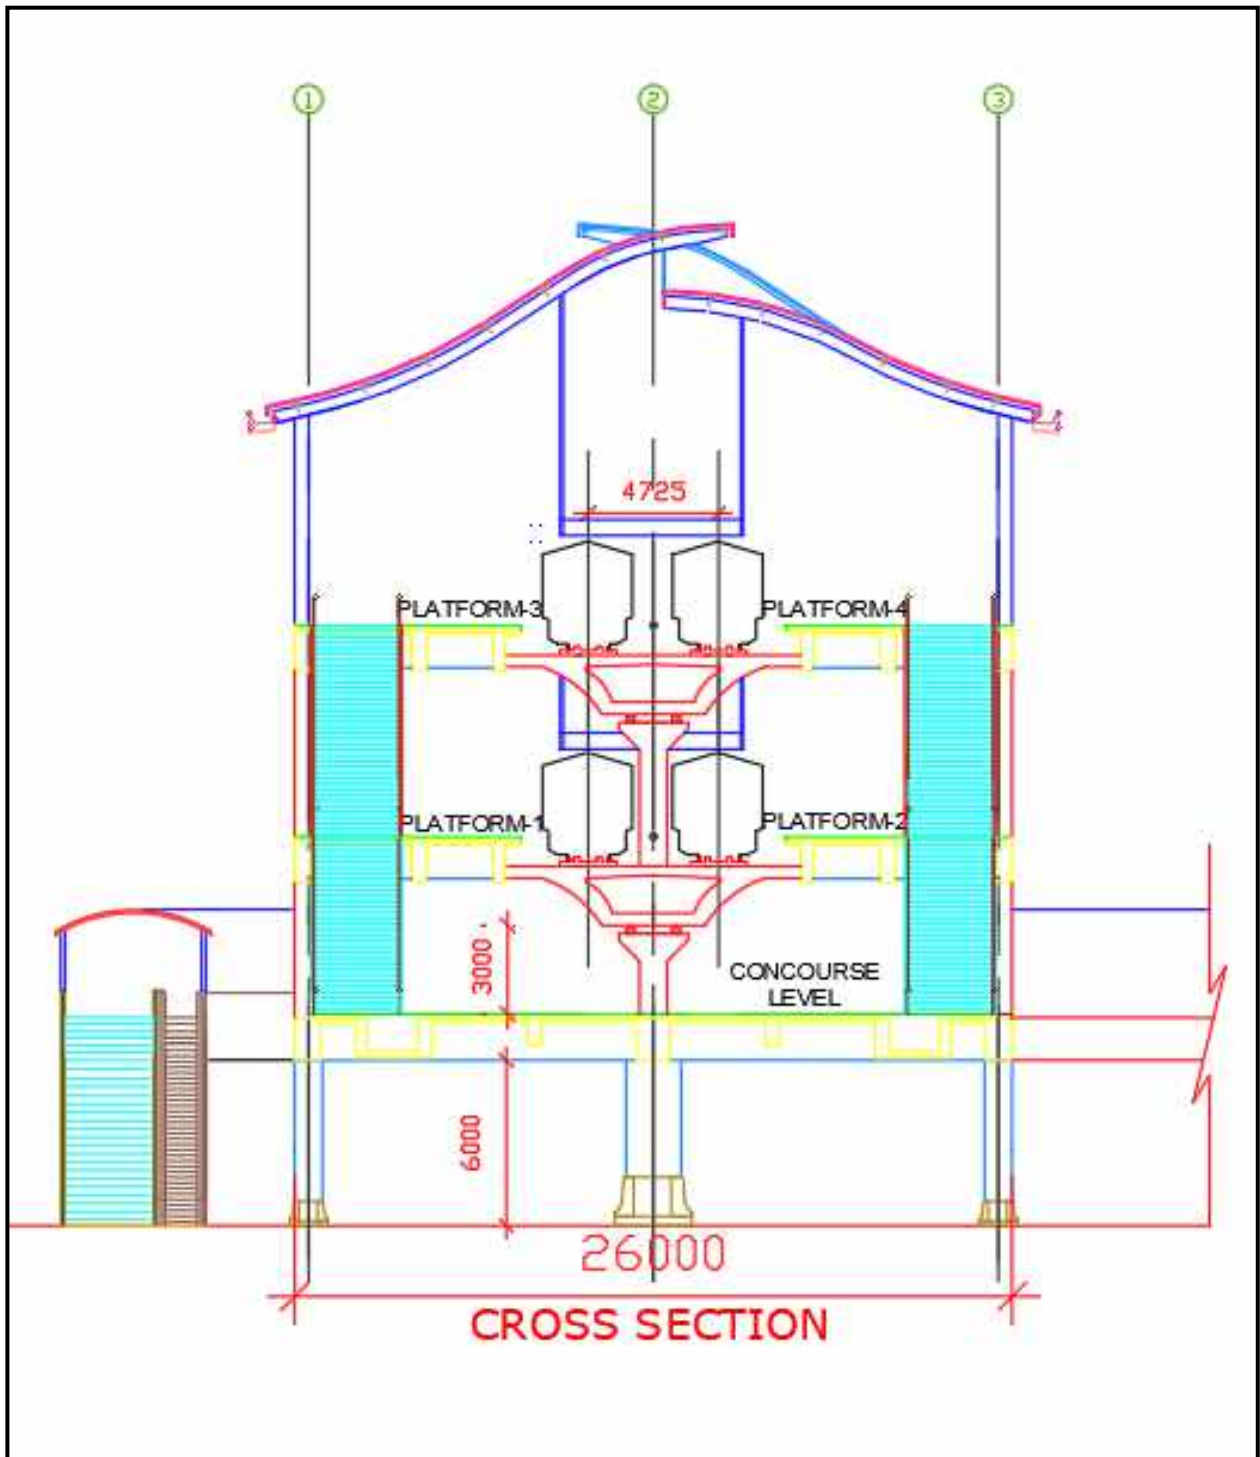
PROPOSED LOTTEGOLLAHALLI STATION (CROSS SECTION)
